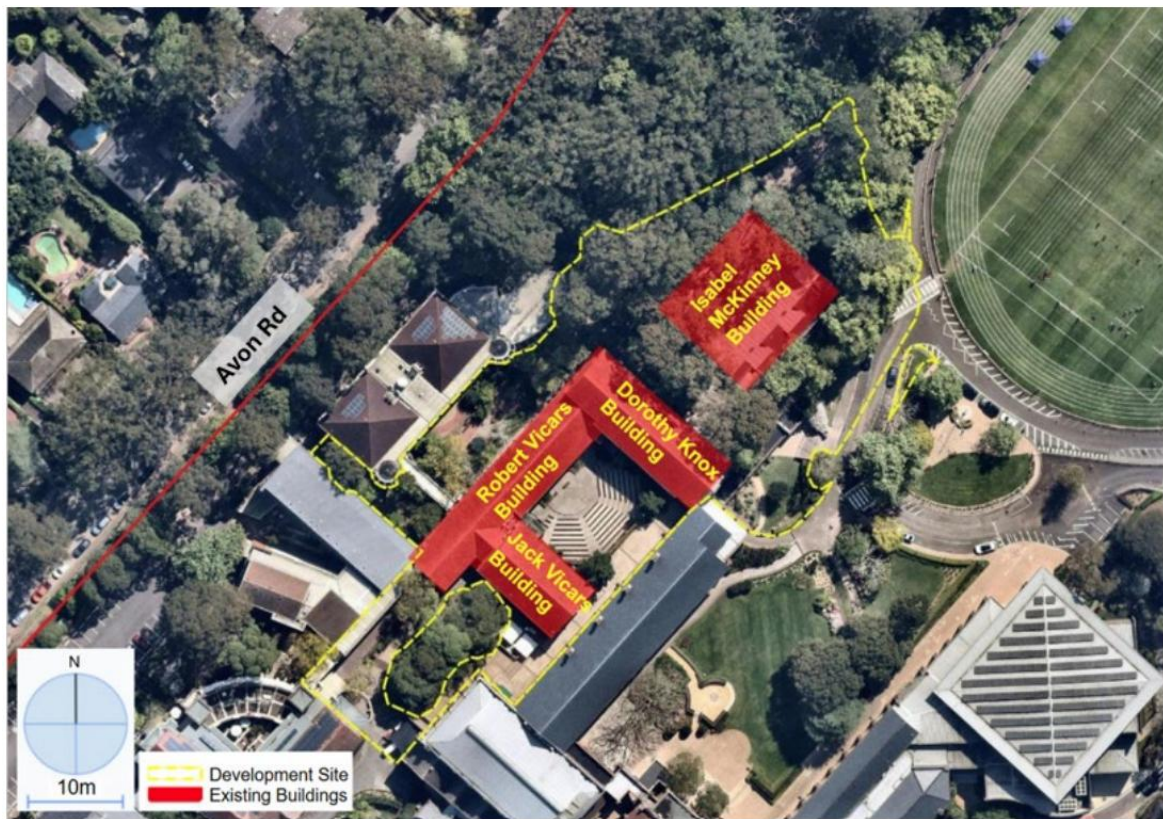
Site layout plan (source: Department's AR Figure 14)
